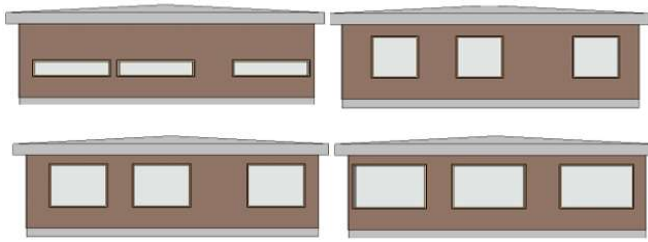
Illustrative Example for Windows Placed at 750mm above the Floor on North/South-facing Wall. Elevations from Top Left to Bottom Right Indicate a WWR of 20%, 30%, 40%, and 50%.
